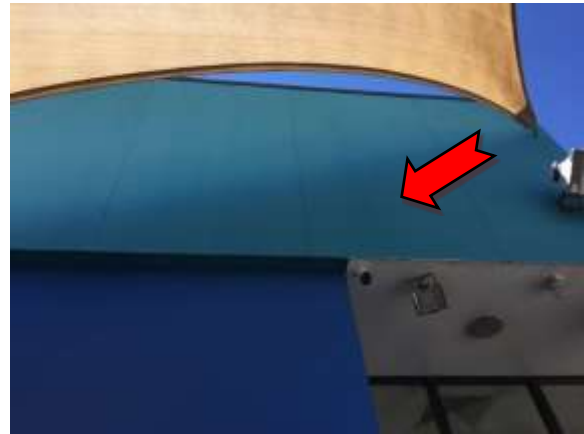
Exterior, car wash, surrounding building, at height – suspected asbestos-containing fibre cement sheeting.
